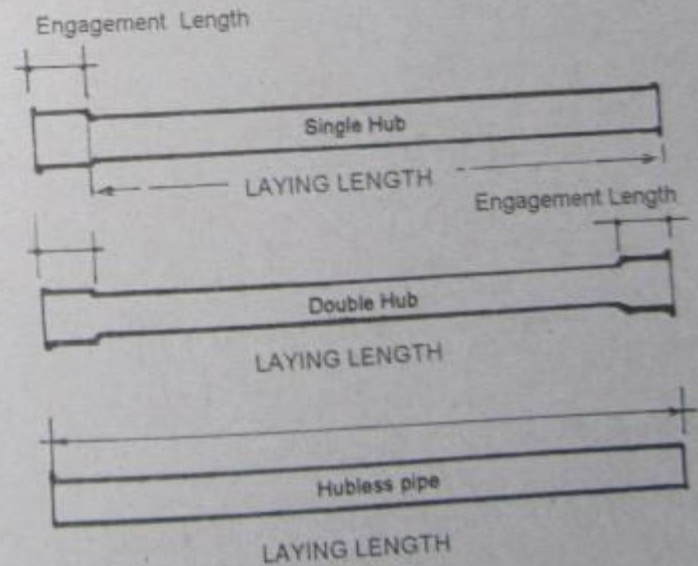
LAYING LENGTH OF CAST IRON PIPE
